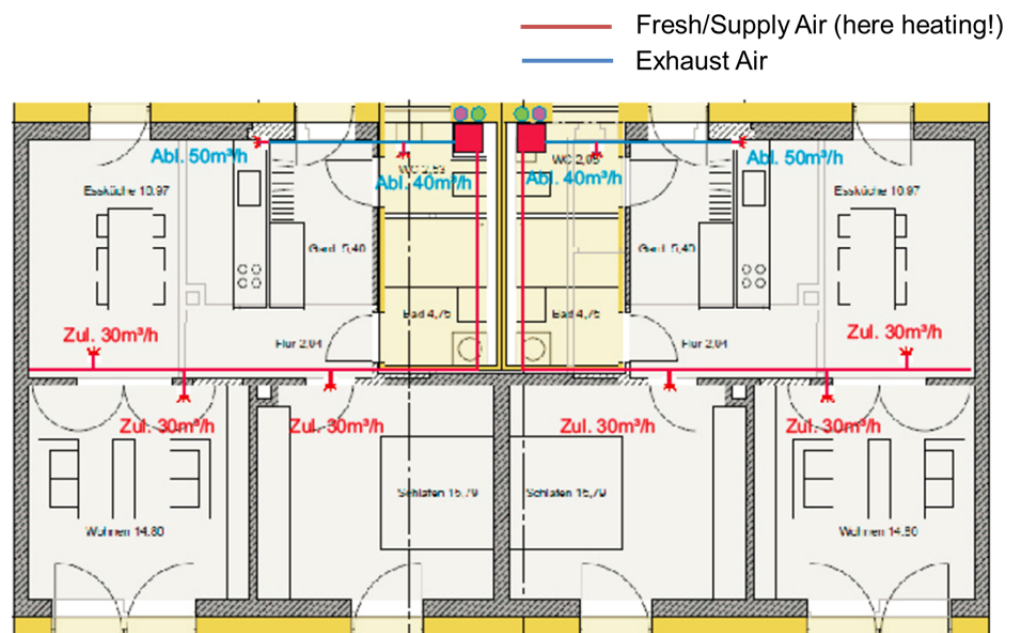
New floor plan with new bathroom, kitchen and supply and exhaust air zones.
